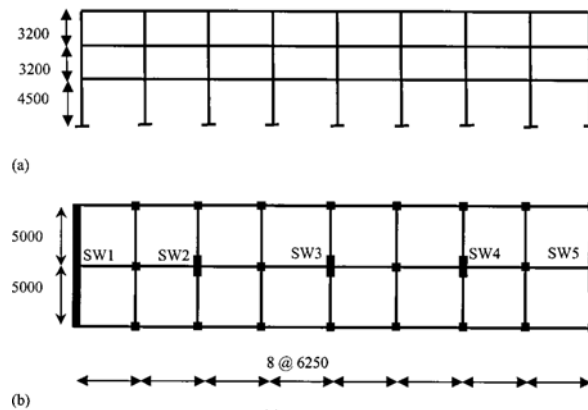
Three-story building with flexible diaphragms in Basu & Jain 2004
